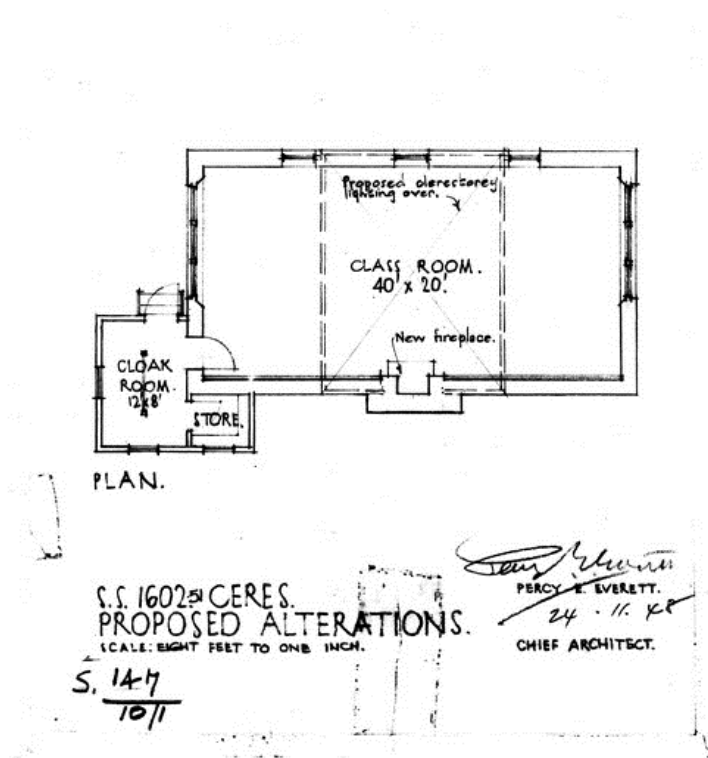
P. Everett, Proposed Alterations to Ceres School – Floor Plan, 24 November 1948
